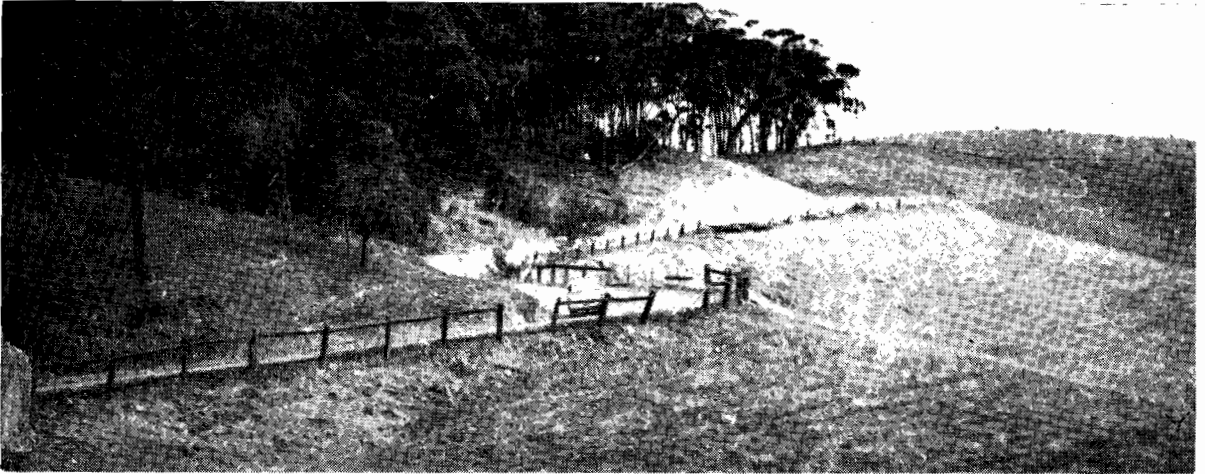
Shires of Chiltern and Wodonga. Before reconstruction and realignment of Wodonga-Beechworth Road approaching Indigo Creek.
